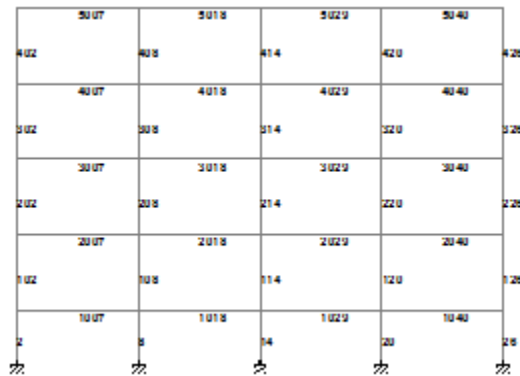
Section B-B in front of node 36 showing beam and column numbering
